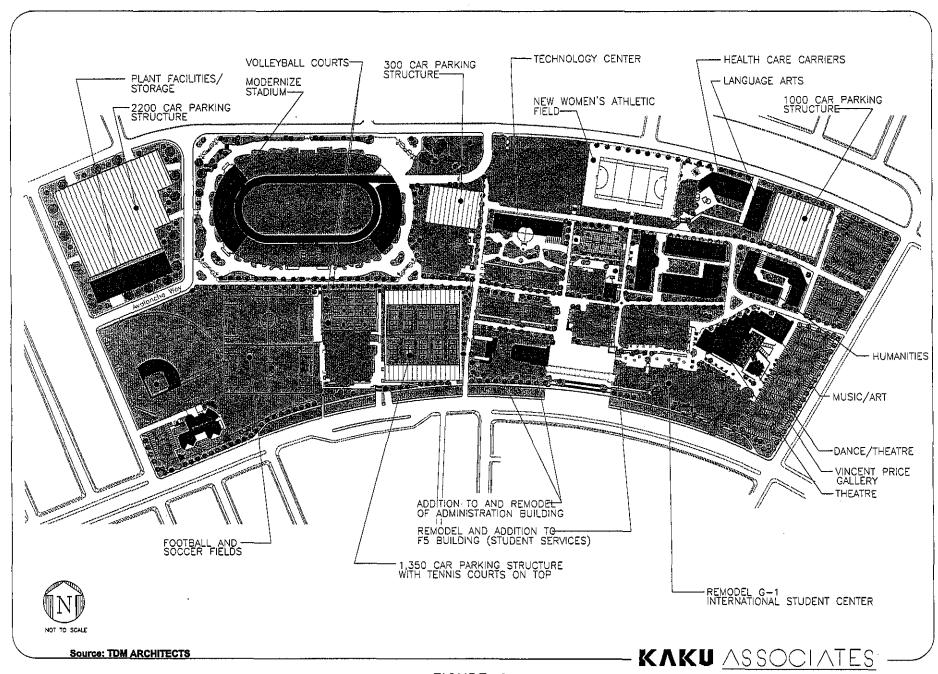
EAST LOS ANGELES COLLEGE CAMPUS MASTER PLAN
